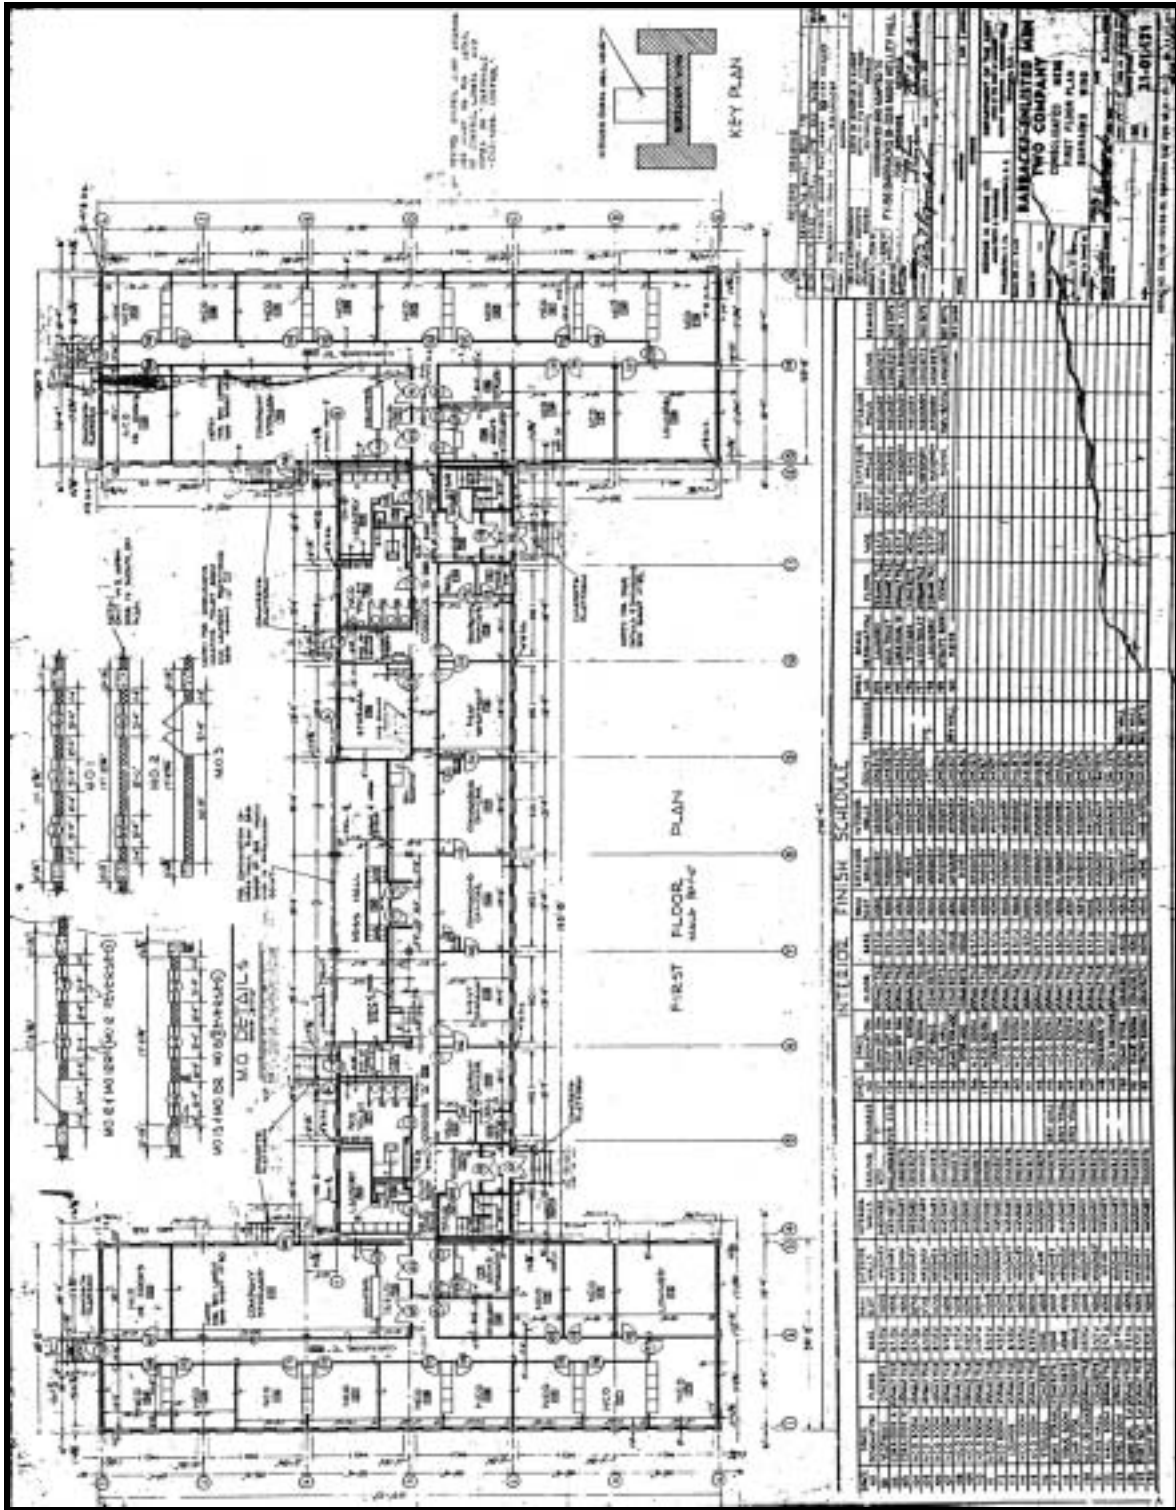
H-style, two-company barracks, barracks wing, first floor plan (1955, revised 1957) (Engineering, Ft. Benning).
